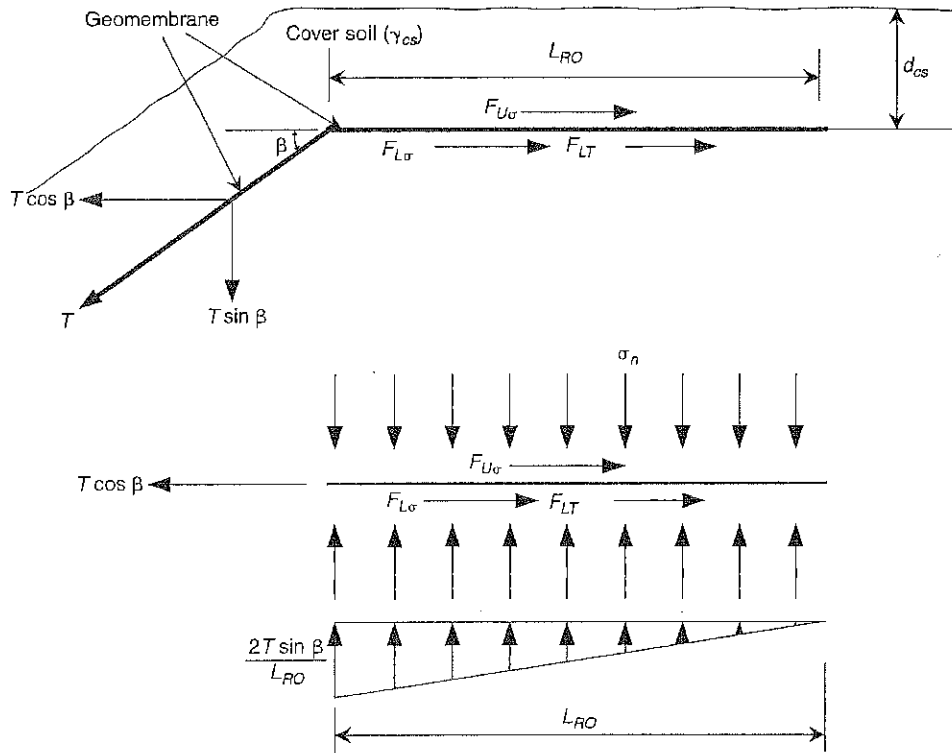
Cross section of geomembrane runout section and related stresses and forces involved.
